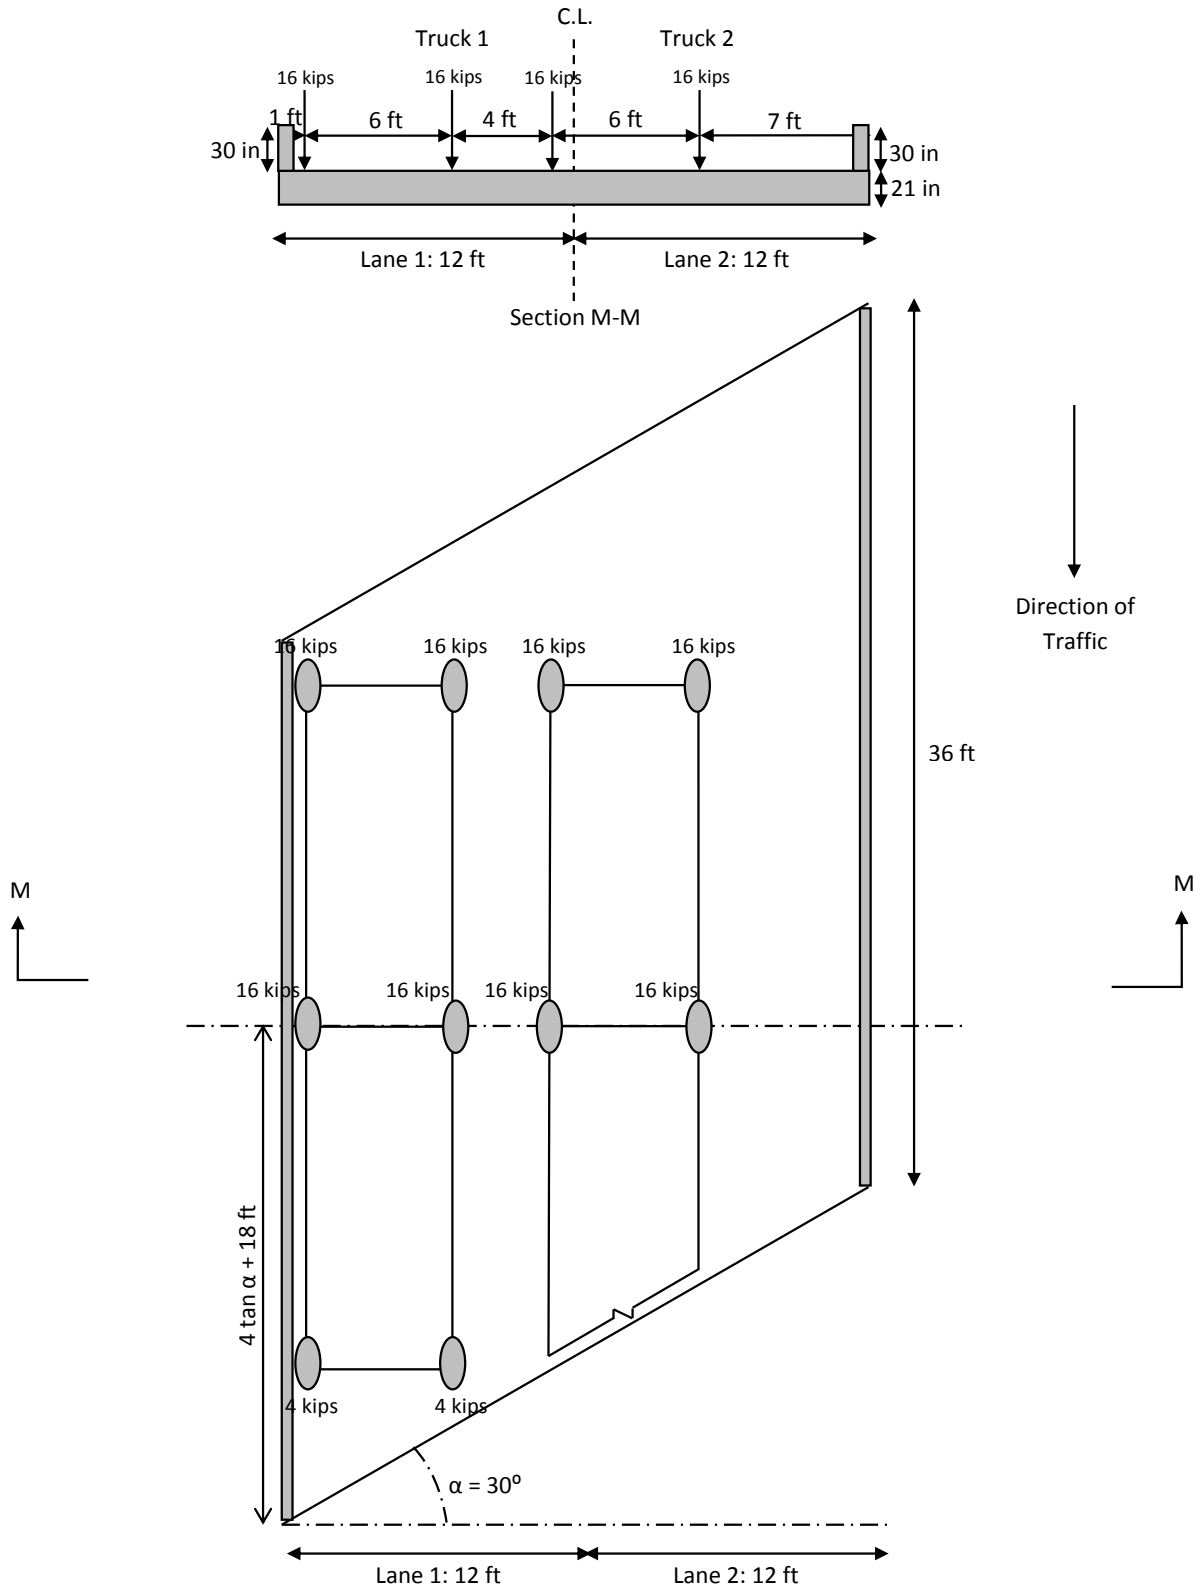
Typical Cross-Section and Plan of a Two-Lane 36 ft Span Skewed Bridge (30 degrees) with Two Railings under Edge Loading E1.
